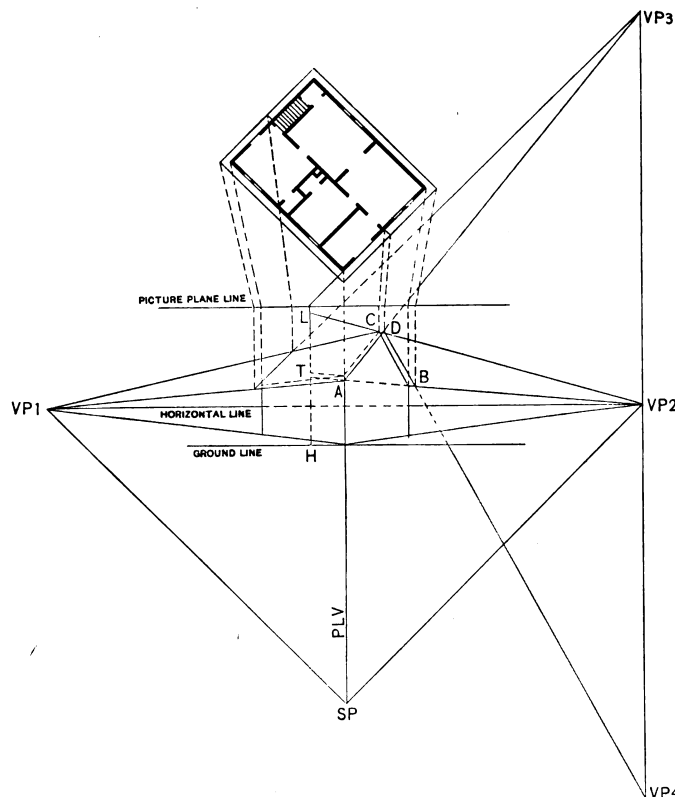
Diagram Showing Method of Obtaining Roof Vanishing Points and Determining Perspective Proportions of Cornice.—Scale, 1-32 Inch to the Foot.
